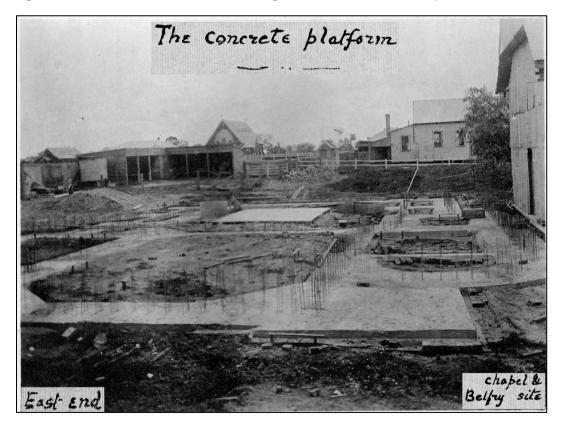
Shallow, reinforced concrete footings constructed in the 1920s (Source: St Ambrose archives)
